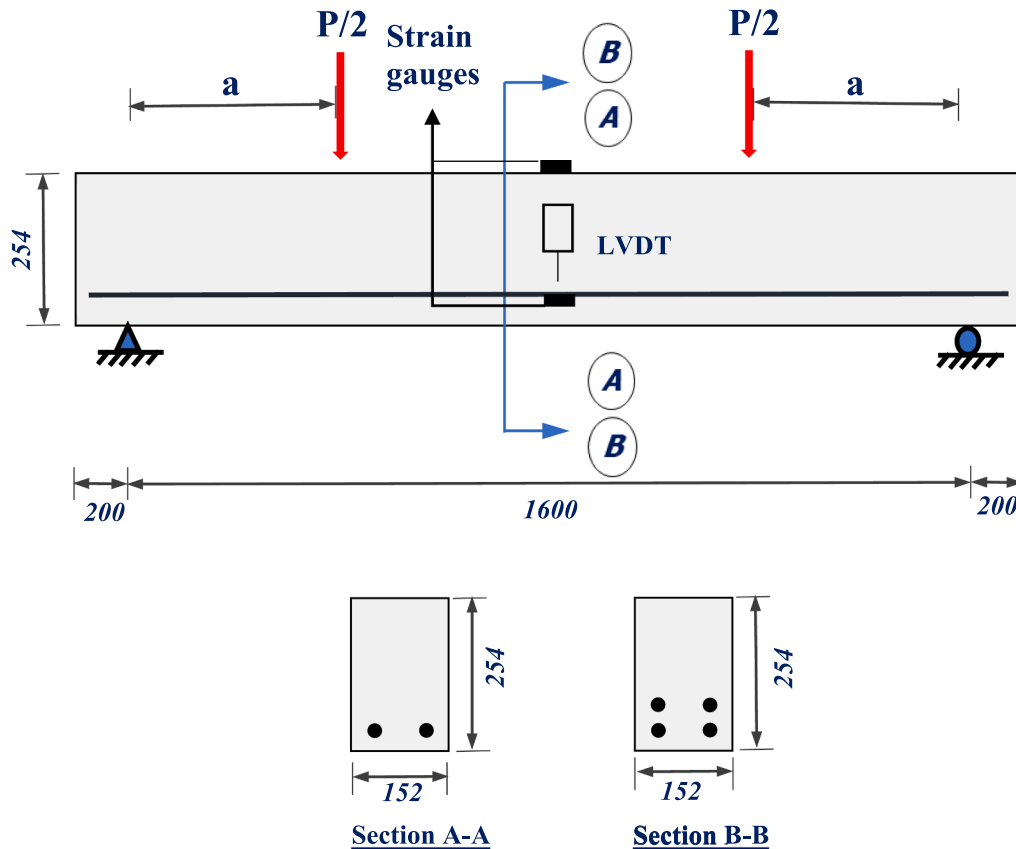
Dimensions and reinforcement details of the beam specimen (all dimensions are in mm).
